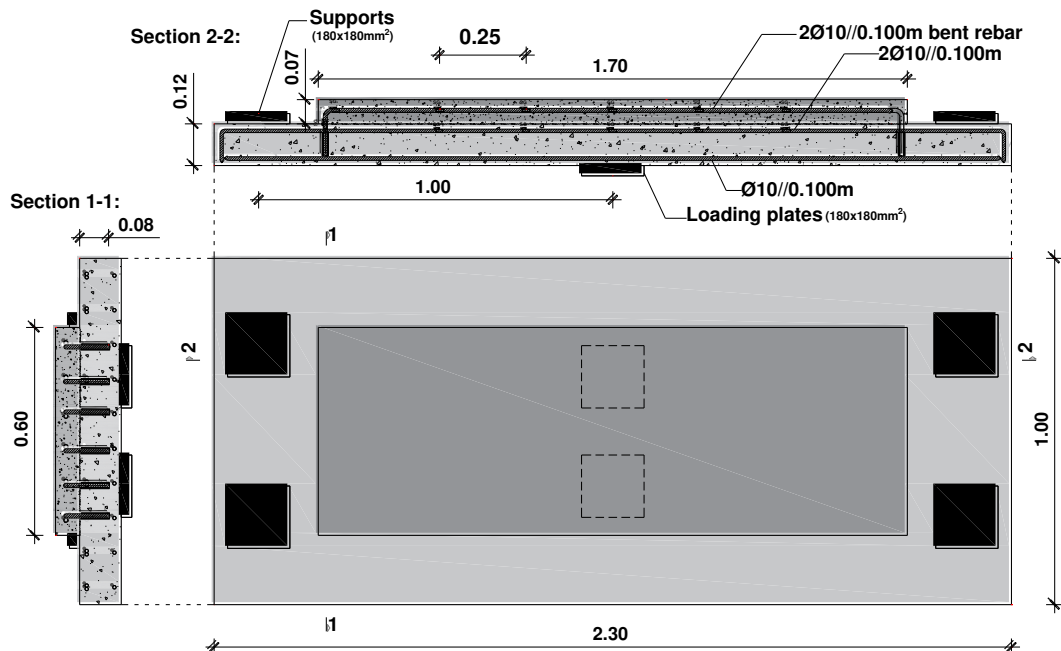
Rebar detailing and strain gauge placing for the  $R_L$ -ANC specimens.
